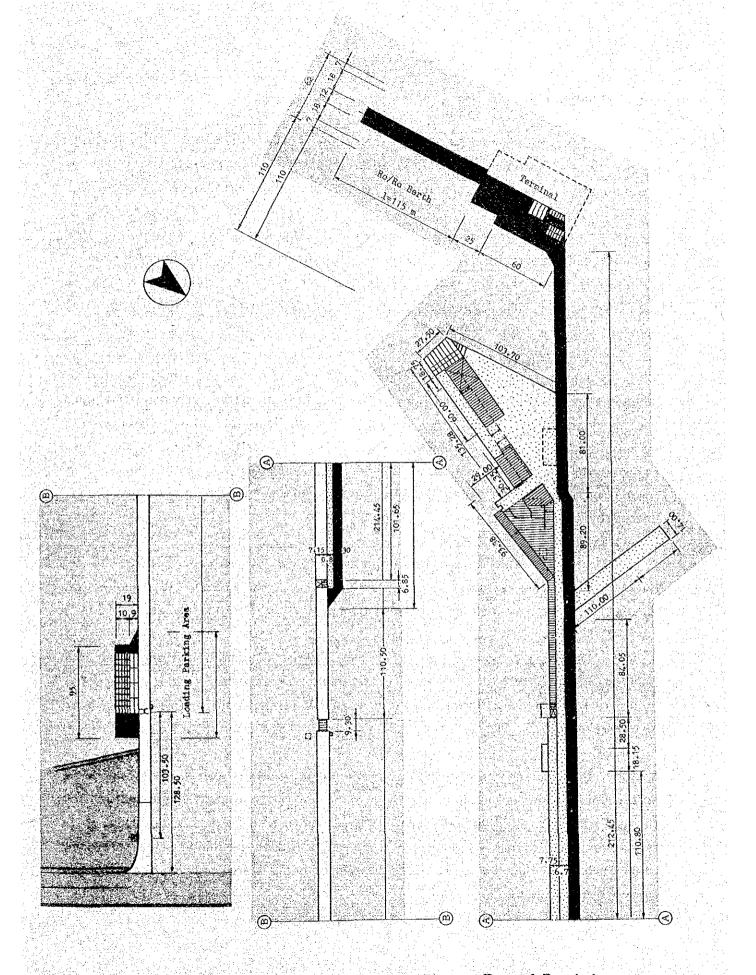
Ro/Ro Terminal Development Plan at Port of Bacolod
